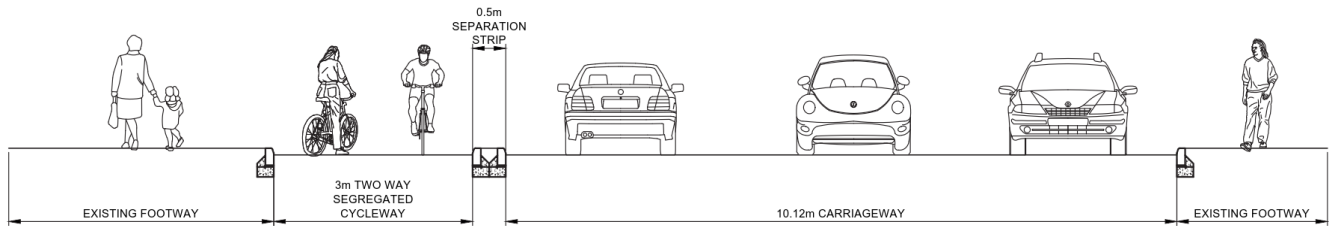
Cross Section Route 7: Newcraighall Road, adjacent to Fort Kinnaird
